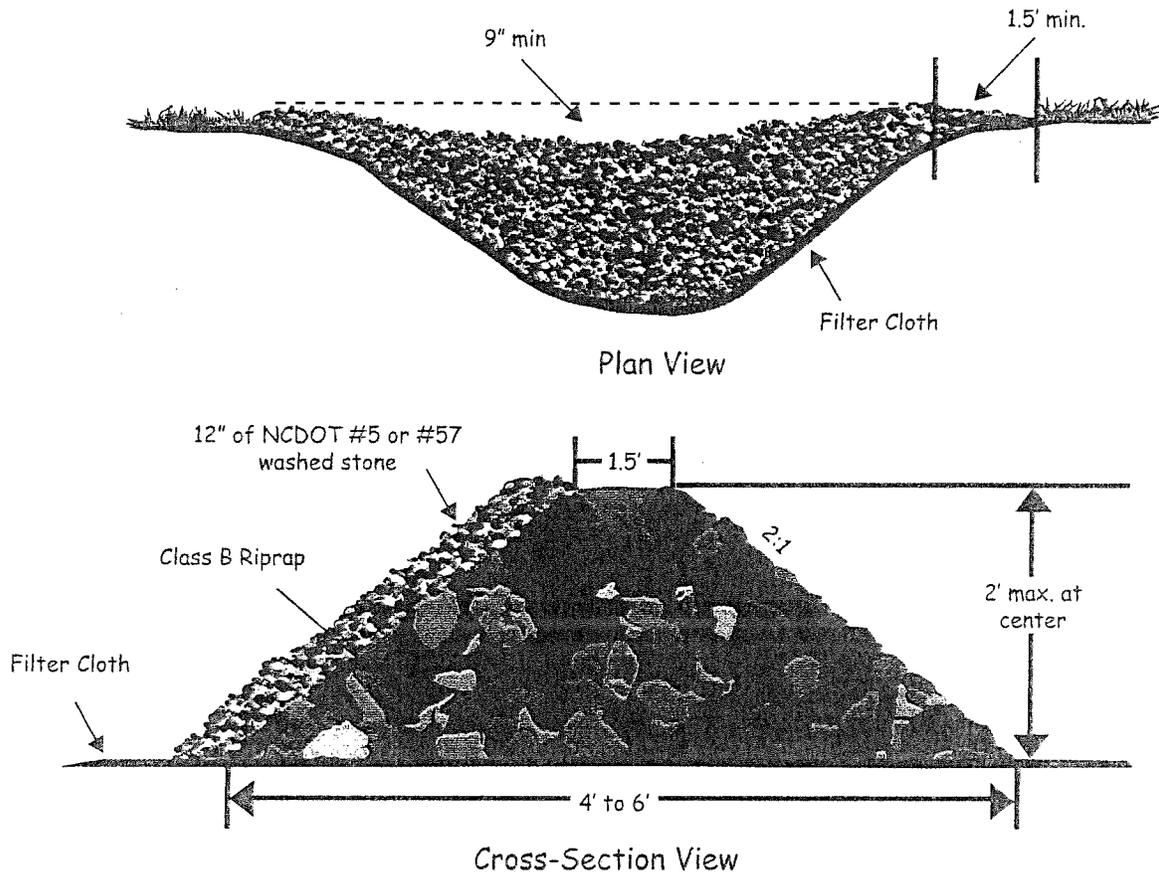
Stone check dam stone should be placed over the channel banks to keep water from cutting around the dam.
